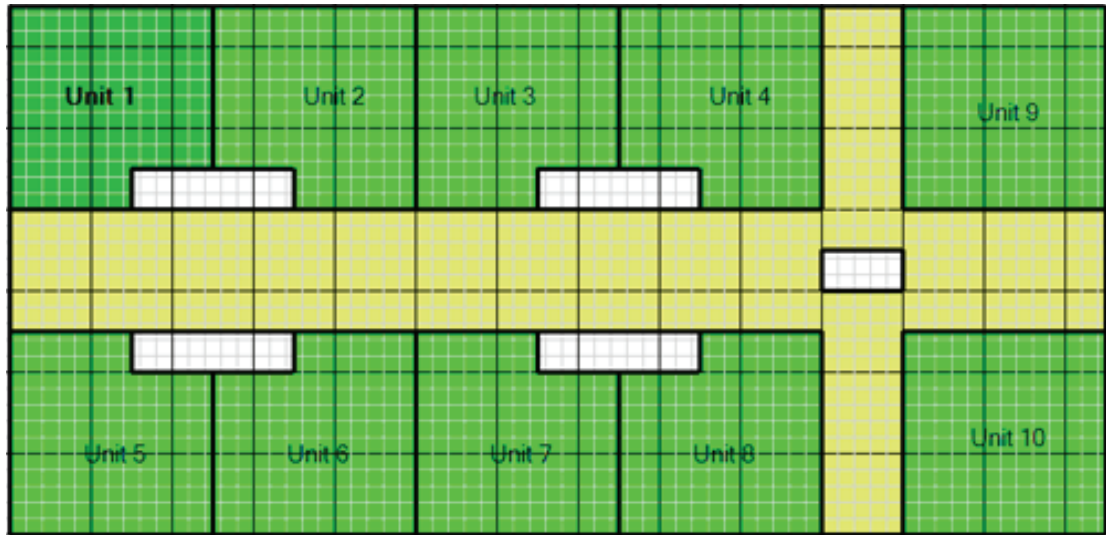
Typical Floor Plan Ground Floor to 5th Floor of the Building Sample.
